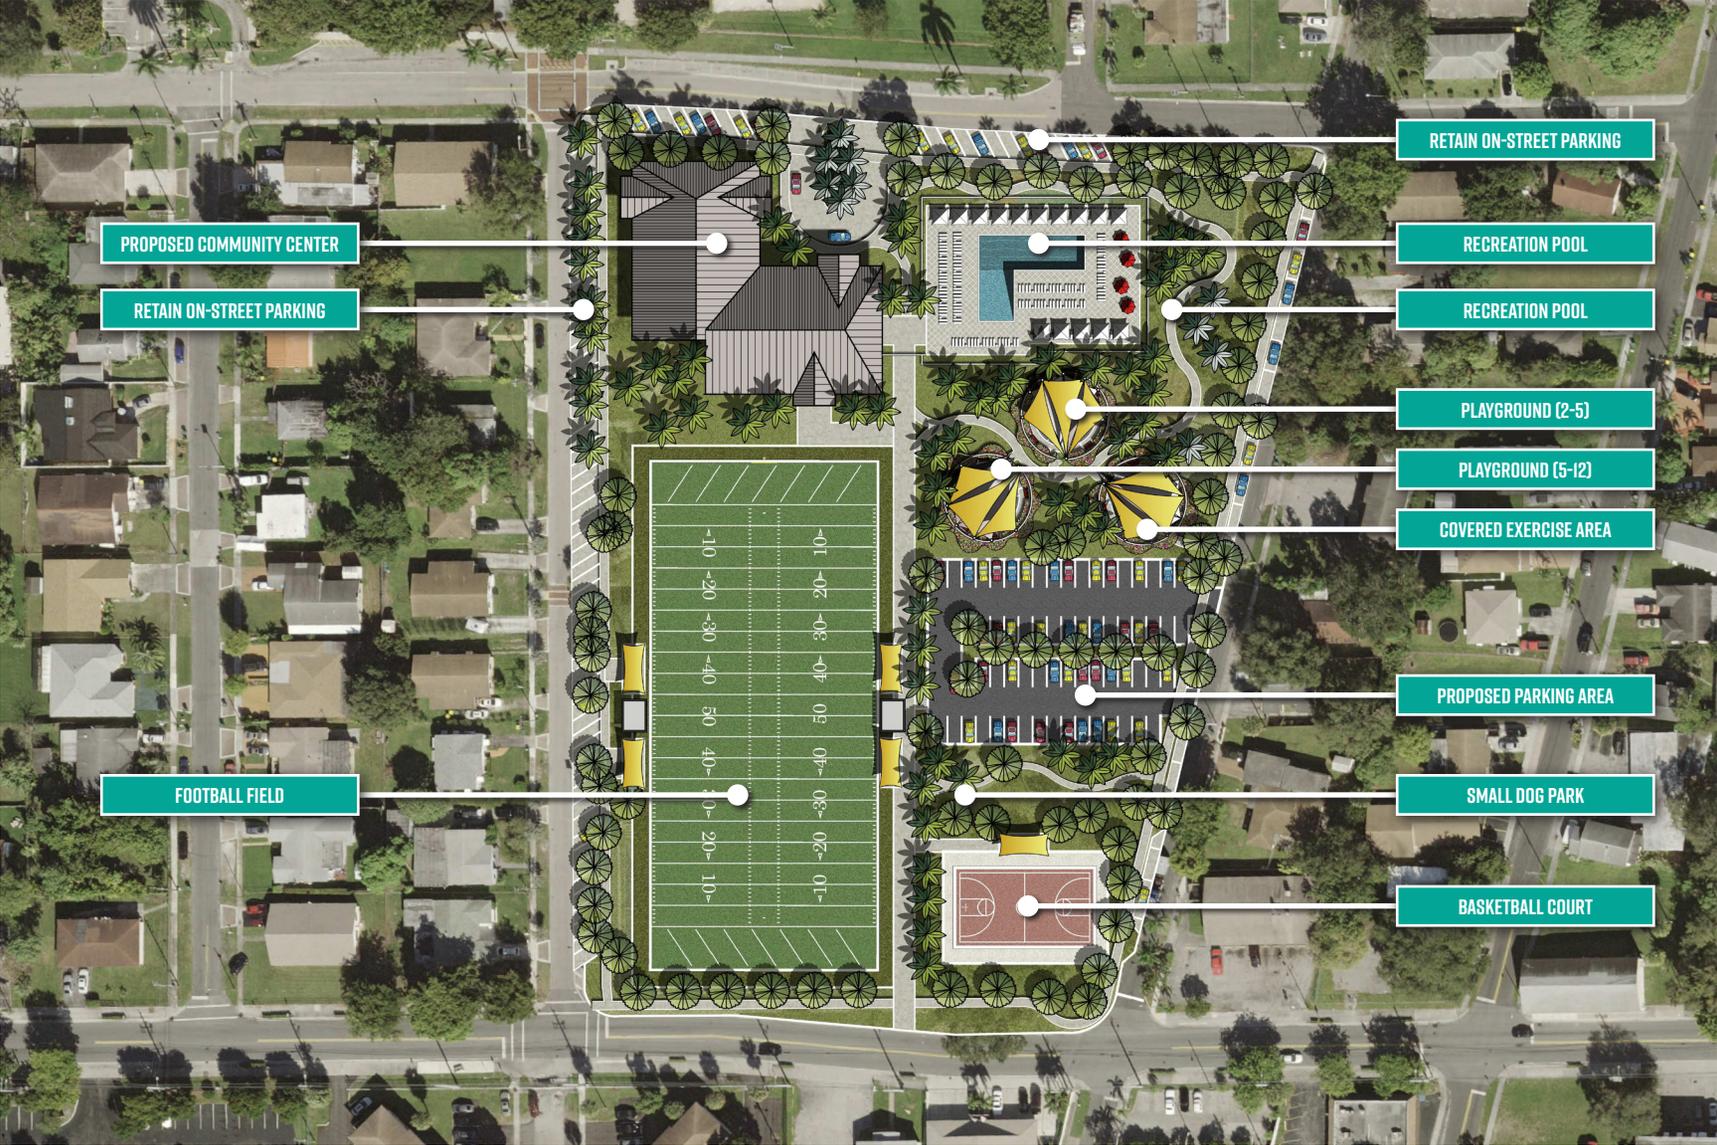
CONCEPT PLAN- C.W. THOMAS PARK CONCEPT PLAN
